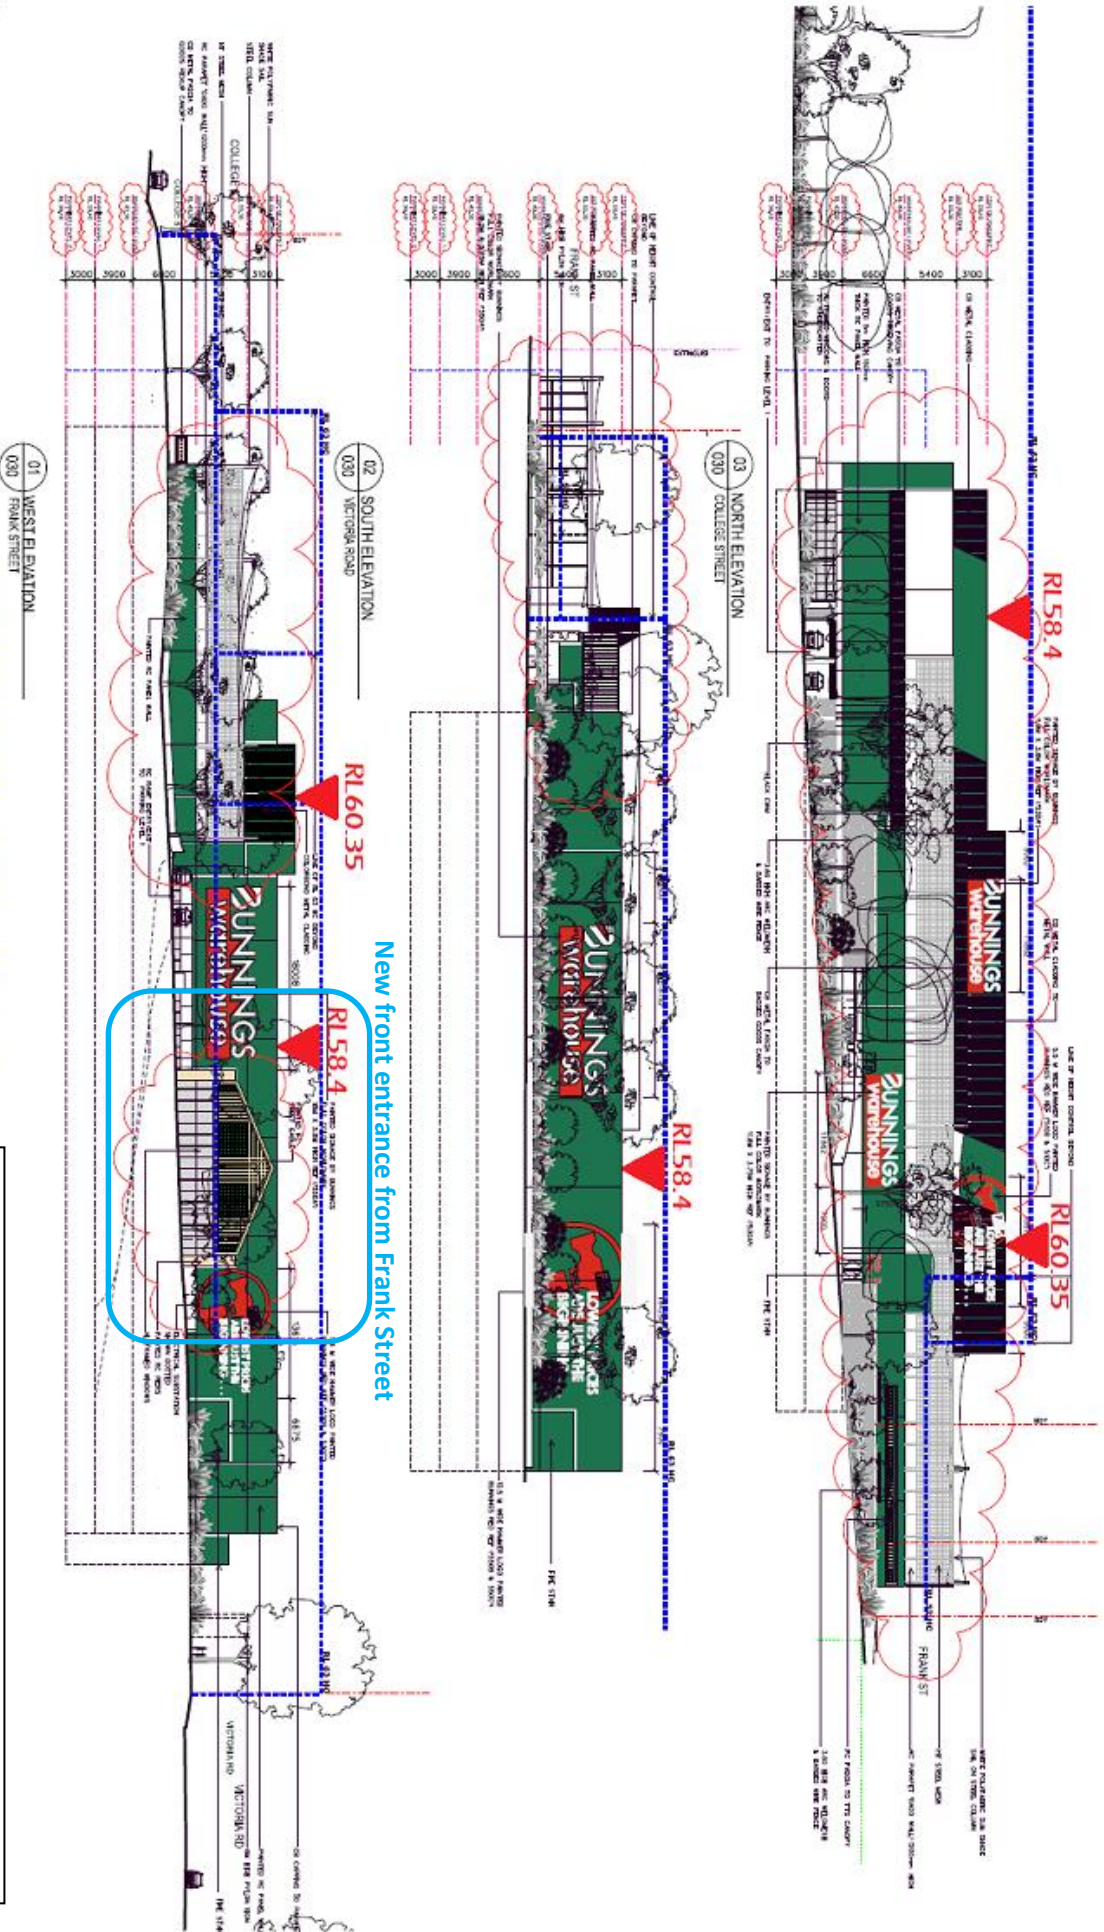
Elevations of proposed (MOD2017/0078) Stage 1 development (Bunnings Warehouse) from Frank Street, Victoria Road and College Street.
